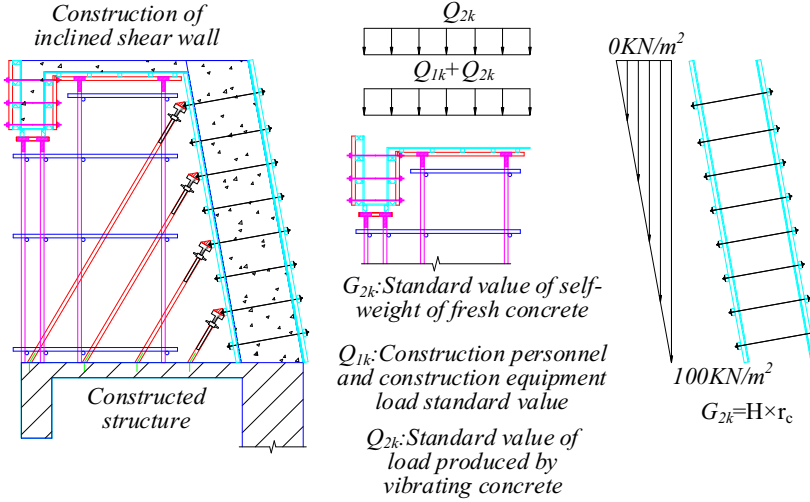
The stress calculation diagram of the core tube inclined wall during construction
